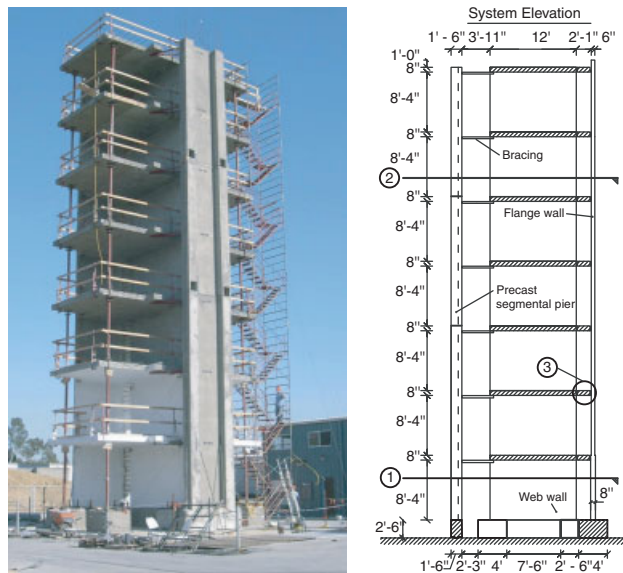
View and elevation of NEES–UCSD specimen (U.S. customary units).
